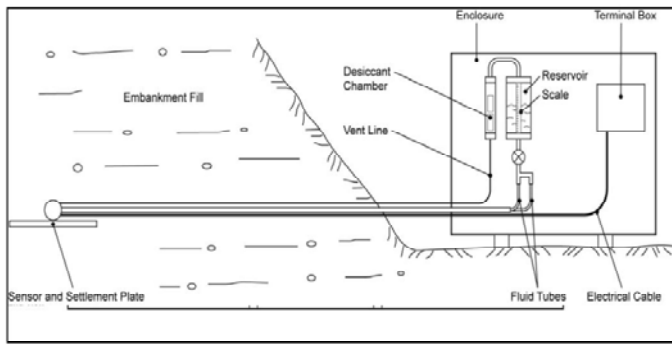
Typical Settlement Sensor and Readout Box Installation Details (Geokon, 2009)
